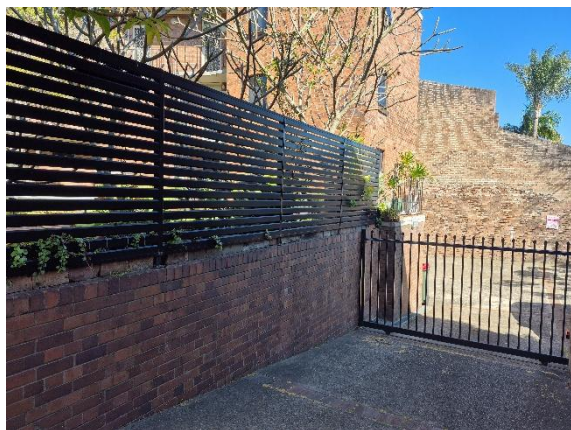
Bottom of the ramp with elevated courtyard at the left.
